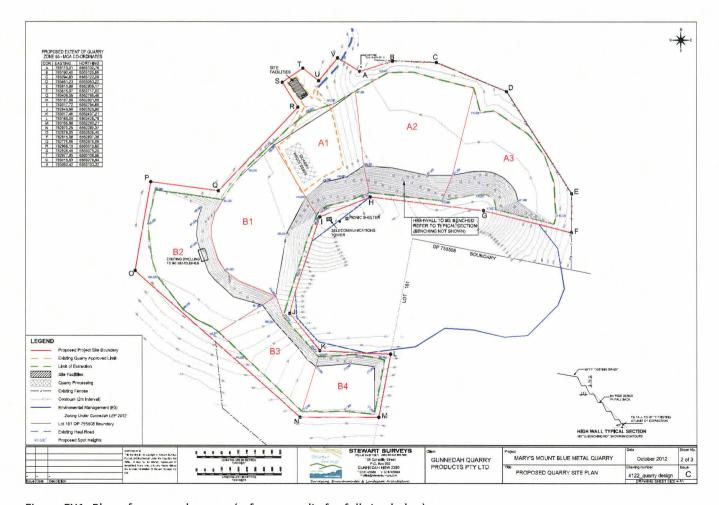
Plan of proposed quarry (refer appendix for full sized plan)
